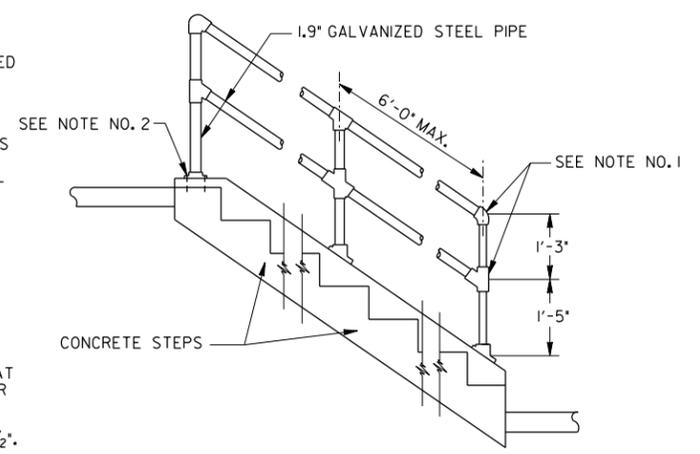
DETAIL OF PIPE HANDRAIL FOR RETAINING WALL
